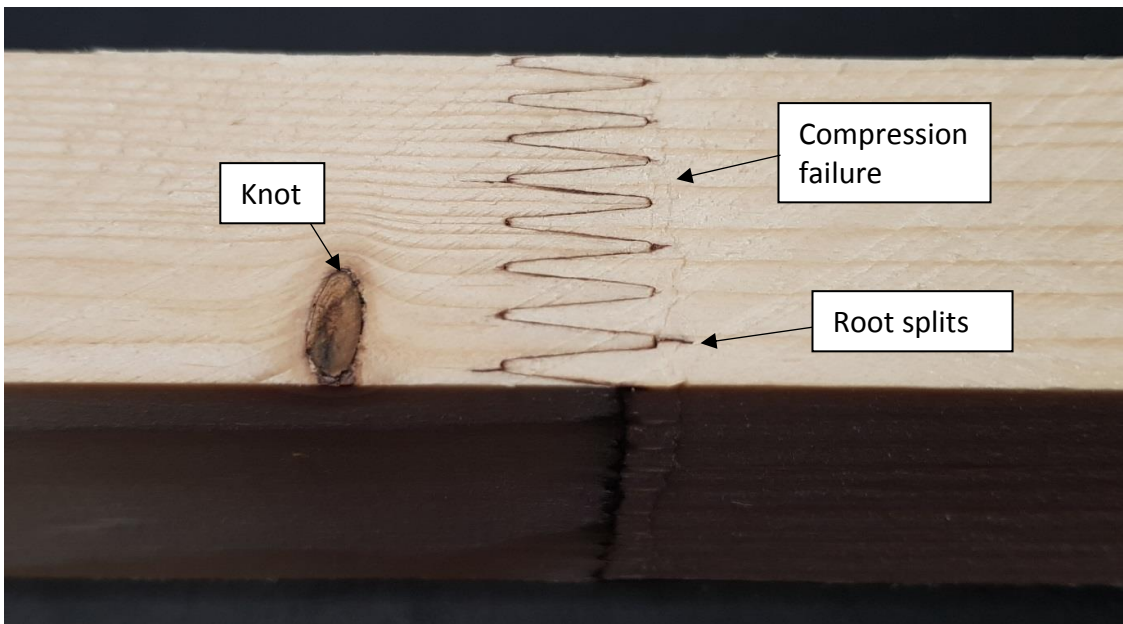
Compression wood failure near finger tips of Spruce specimen
